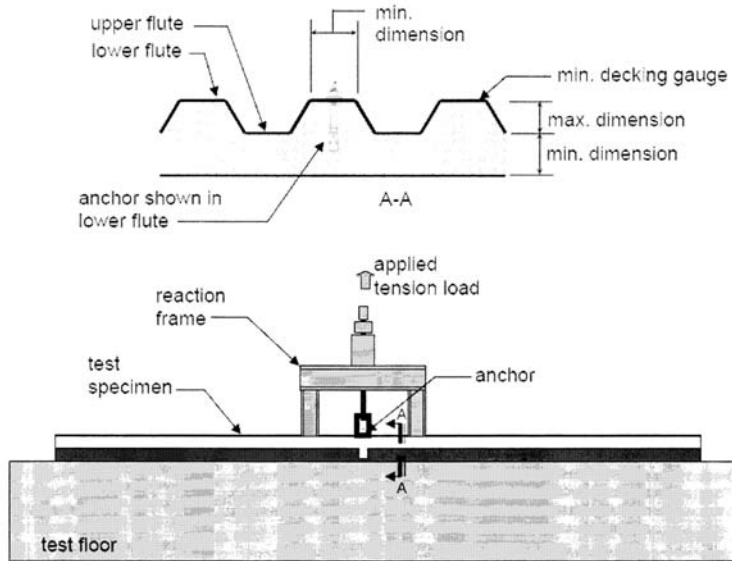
Example of a Setup for Testing Anchors in Concrete Through Metal Decking
